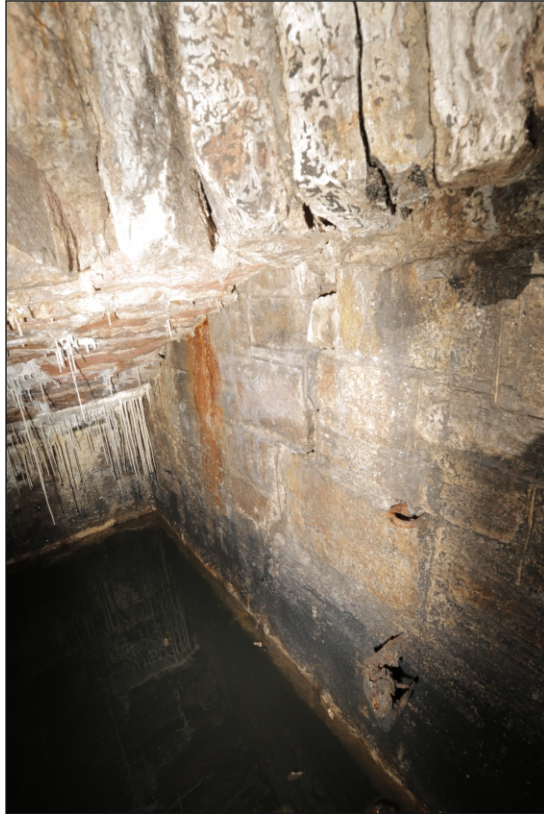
Typical internal wall construction of east tank. Also showing iron fixings to right of image
